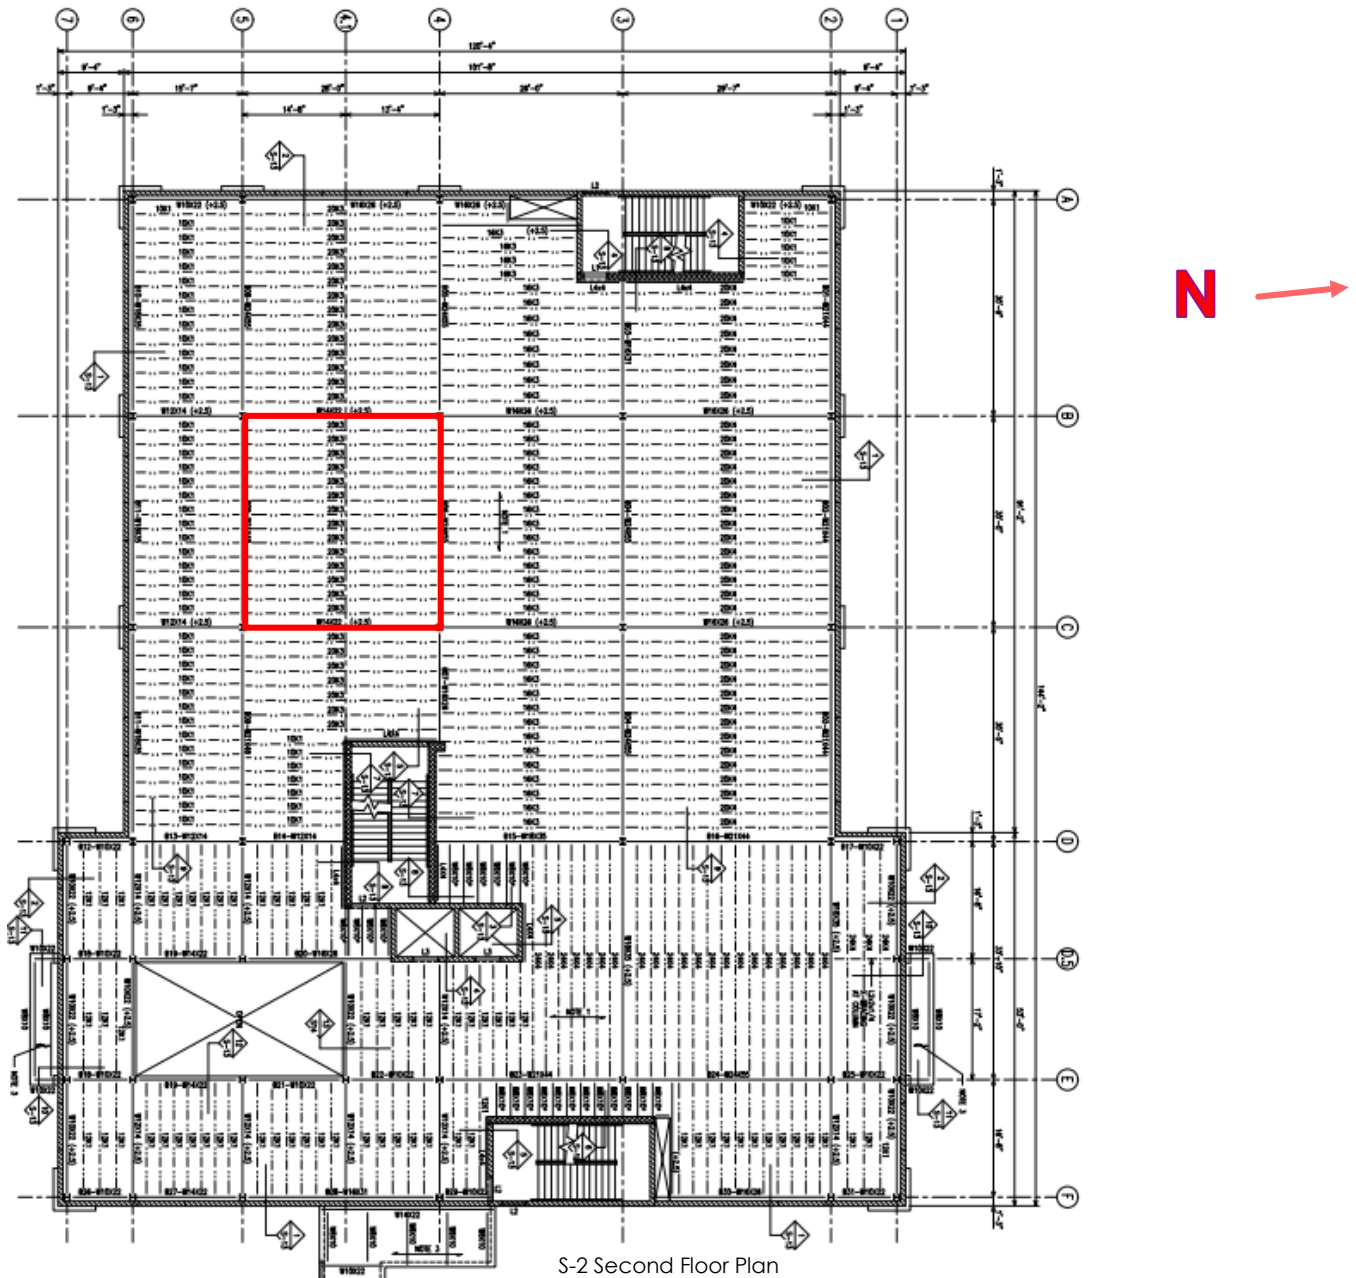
A full second floor plan with a typical bay noted in red. The span directions change at column line D.
